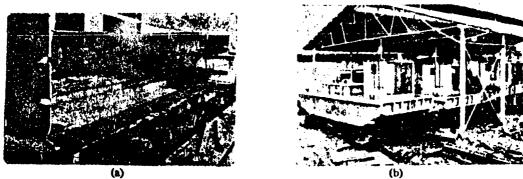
12 m Prestressed high tensile wire reinforced fibrous ferrocement motorized barges being built in a Jakarta yard. Note use of precast parts for the construction. Over 60 such barges have been built in a 2-year period.
